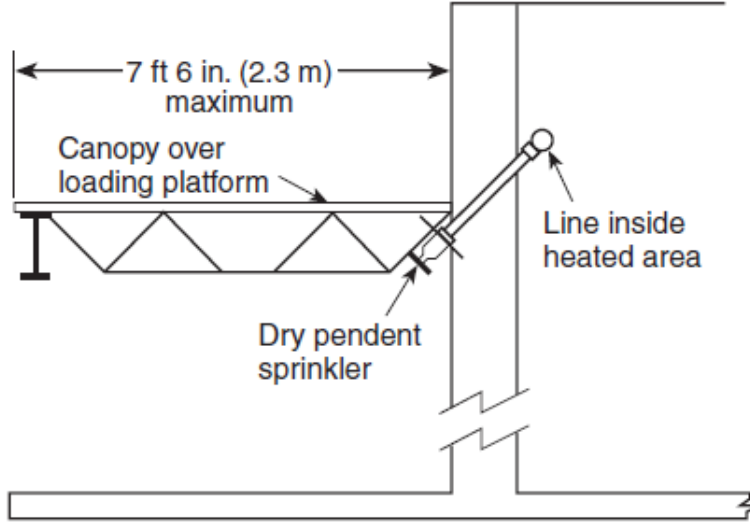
Dry Pendent Sprinklers for Protection of Covered Platforms, Loading Docks, and Similar Areas.
